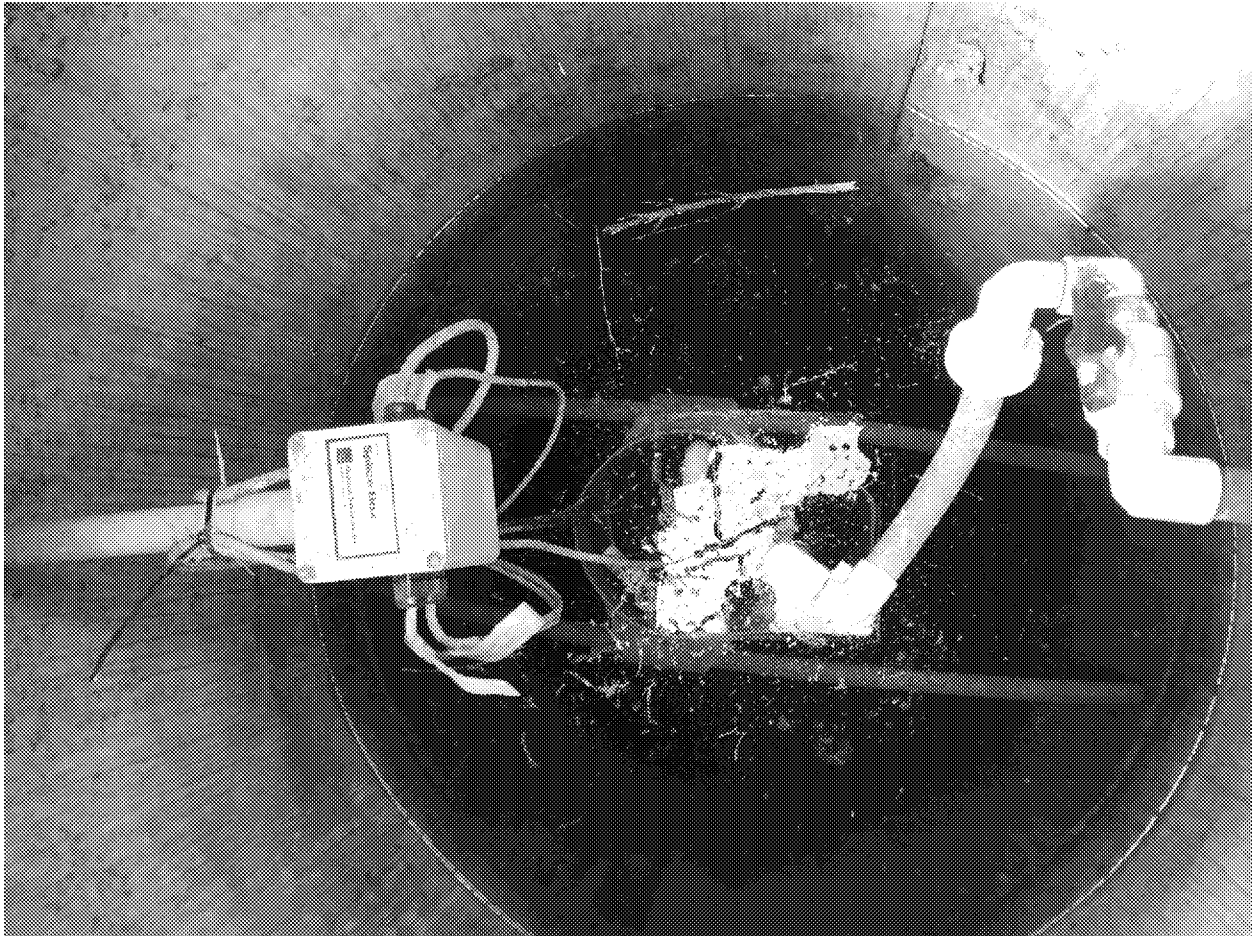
Connect to Existing Drainfield Dosing Lift Station
